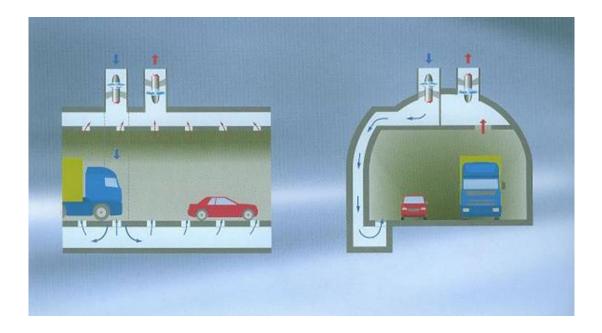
Indicative Transverse Road Tunnel Ventilation System
